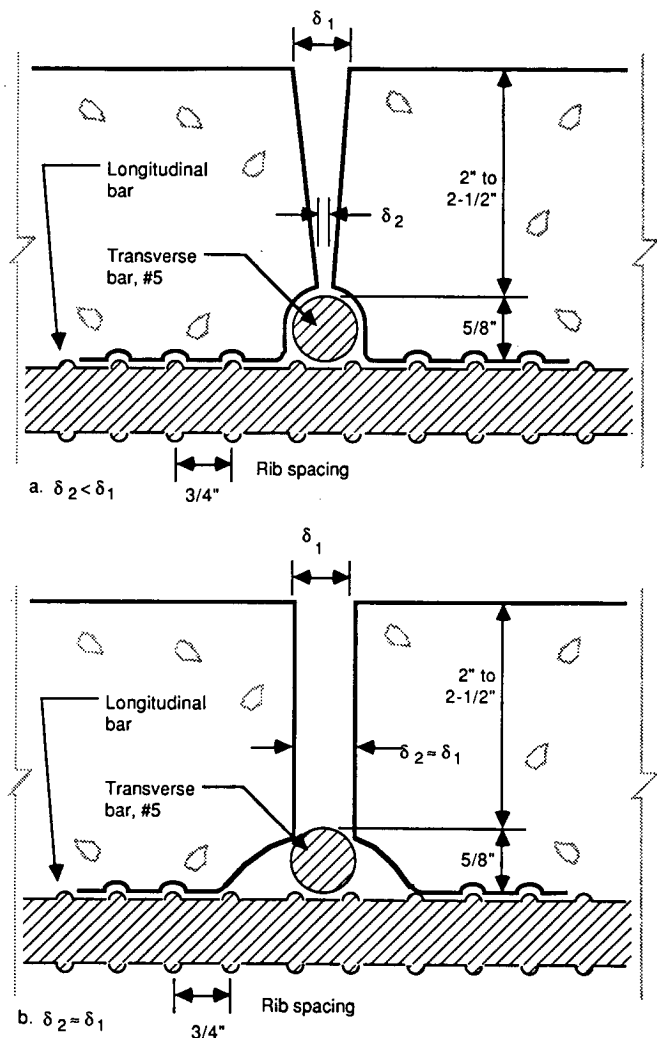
Exaggerated schematic diagram of breaking of concrete bond and widening of crack at bar surface.
